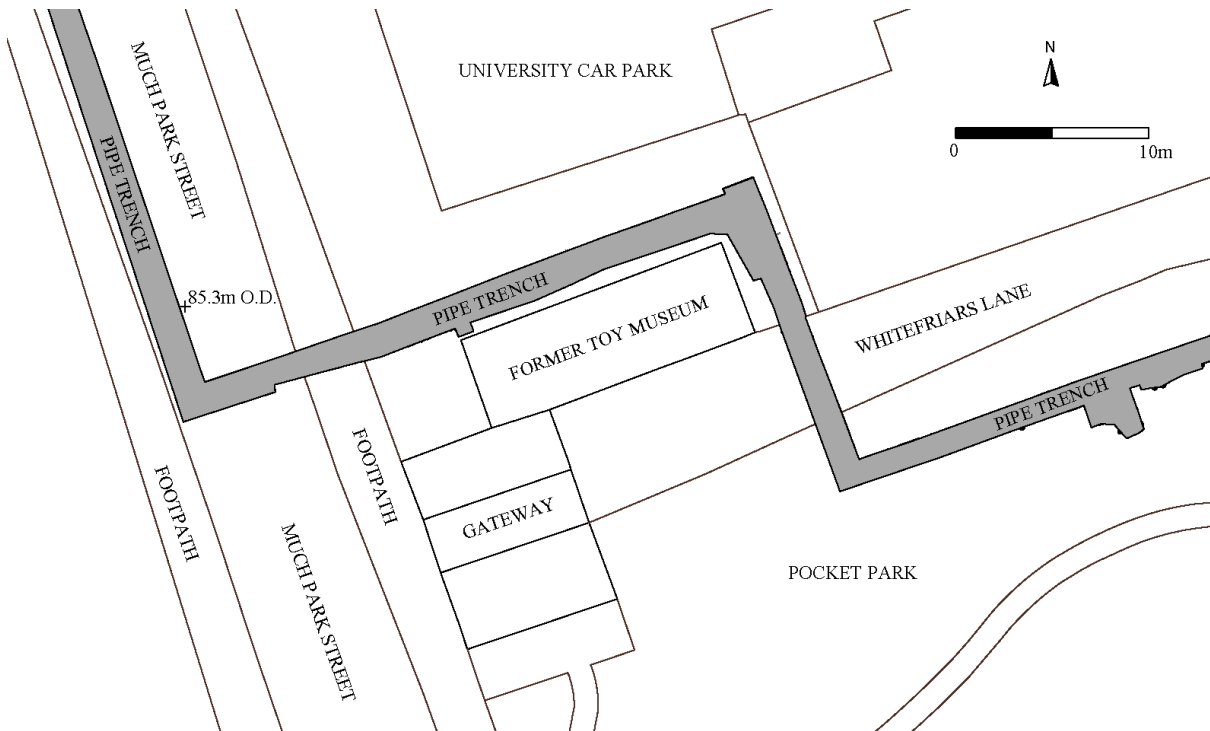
Detailed location plan of trench around Whitefriars Gateway / Much Park Street
